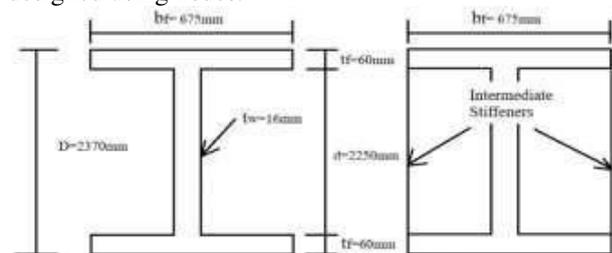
Cross-section of Plate Girder with and without stiffeners
